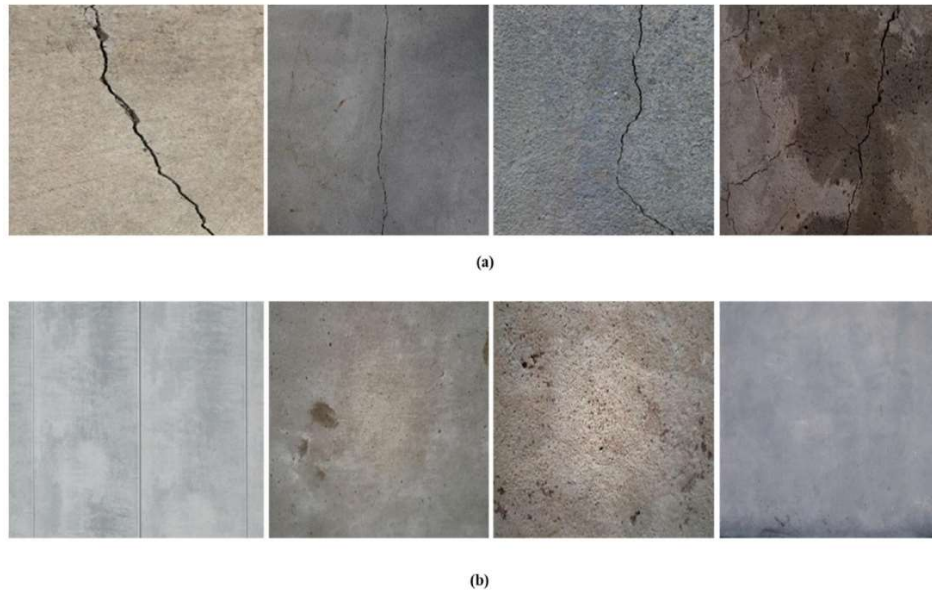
(a)–(b). Representative concrete surface images from the crack dataset showing (a) structural surfaces containing visible crack defects and (b) non-cracked concrete surfaces used for comparative damage classification and model training
